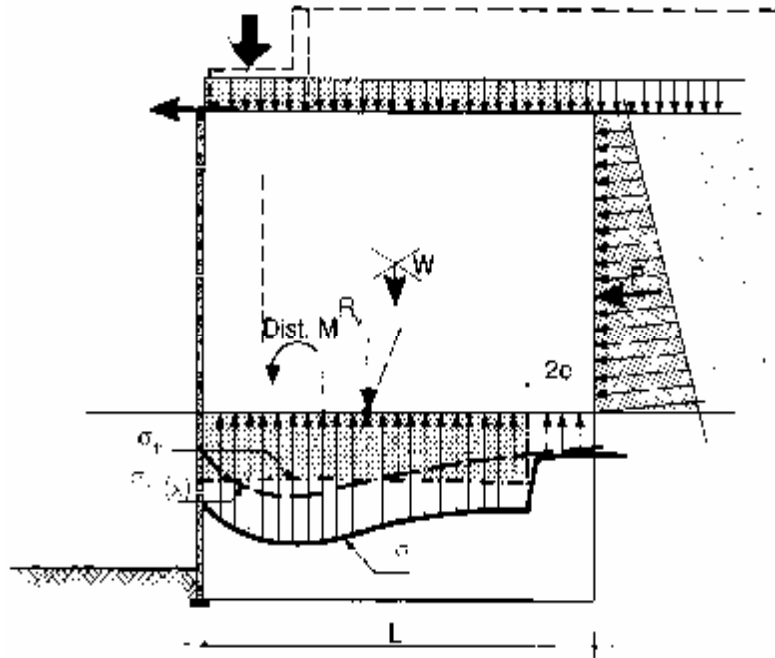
Superimposed Vertical Stress in a "True Bridge Abutment".
